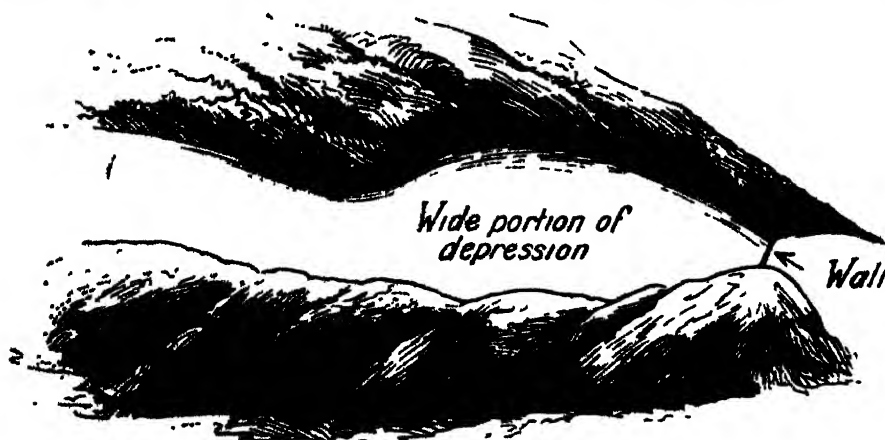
A Type of Depression suited to the construction of a wall dam.
